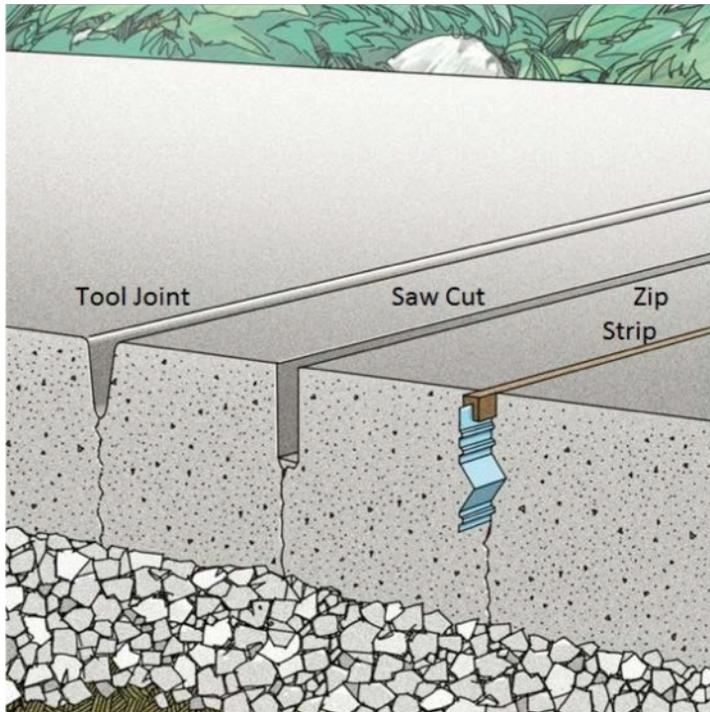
Typical sawcut and tooled joint in concrete slab
